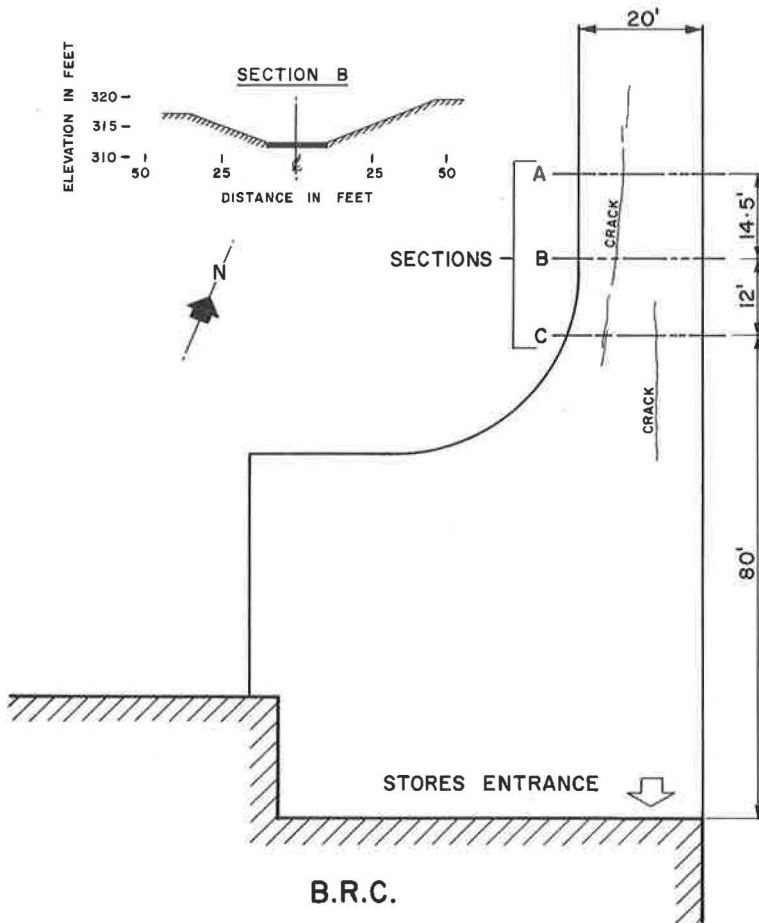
Plan of rear of Building Research Centre showing position of cracks in road-way and sections studied.
